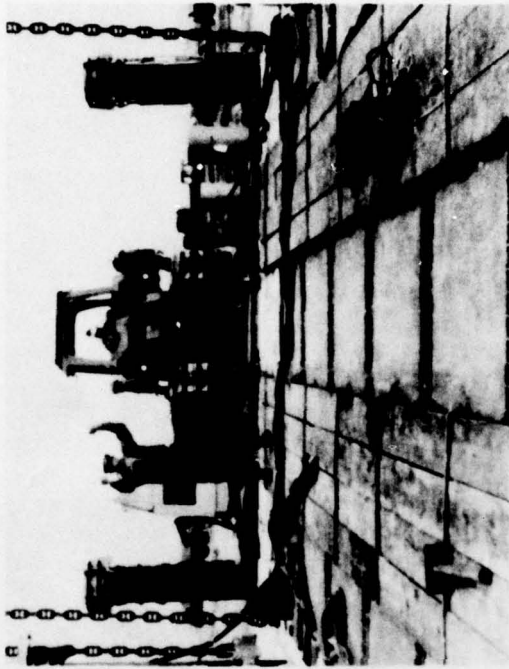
End-connecting causeway sections with TD-25 dozer after elevating.
